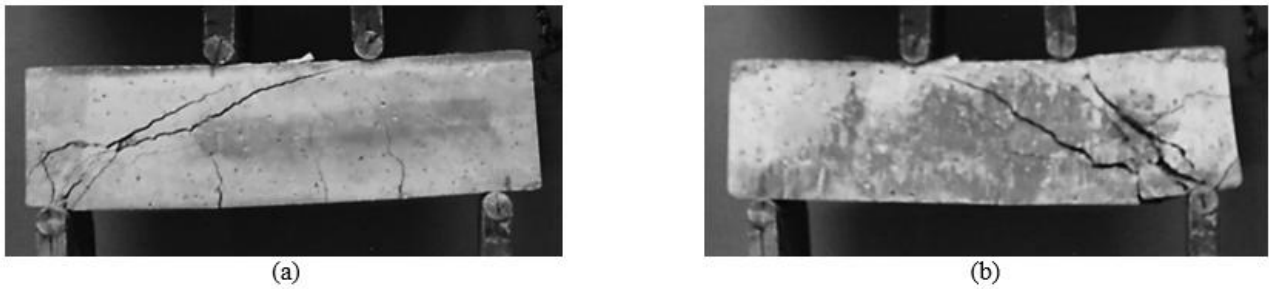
Crack formation behavior and failure mechanism of beams reinforced with steel rebars:
